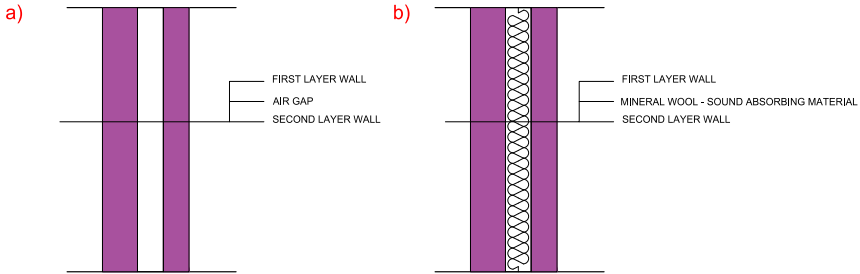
Double-layer wall systems, a) no mineral wool in the air gap between walls, b) the existence of mineral wool in the air gap between walls
